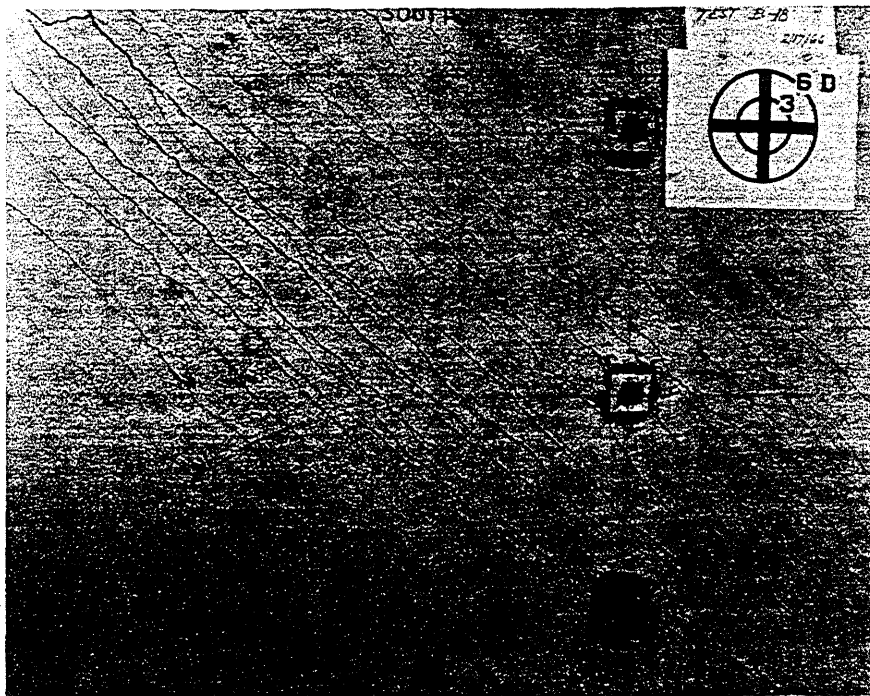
CRACK PATTERN IN BOTTOM SURFACE OF B18
